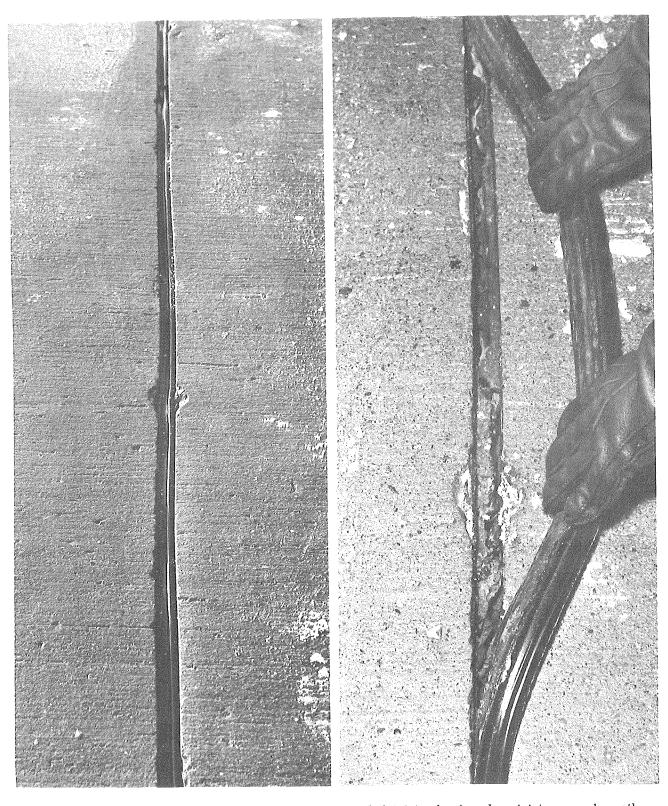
General and detailed views of neoprene sealed joint, showing clean joint groove beneath sealant. Joint was formed by 1/2-in. wide styrofoam, and width when photographed was 0.96 in. (Sta. 600+70, westbound traffic lane, Project EBACI 33083A, C1).
